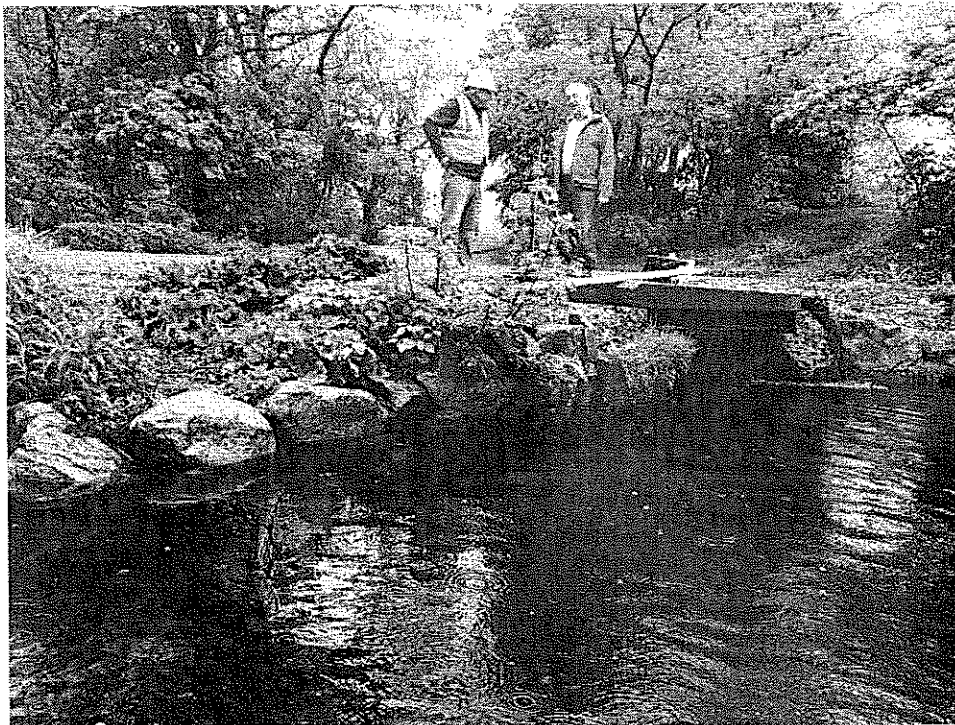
View of left stone masonry wall, facing east; note overgrown vegetation.
